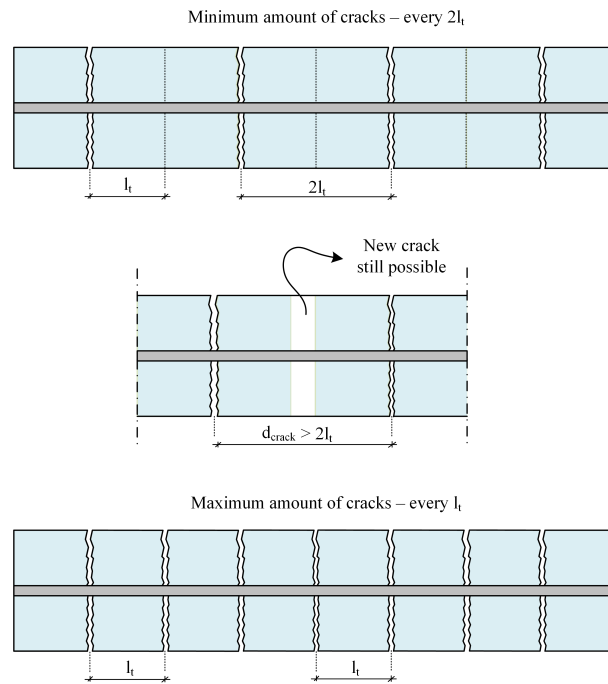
Minimum and maximum amount of possible cracks in a reinforced concrete member
